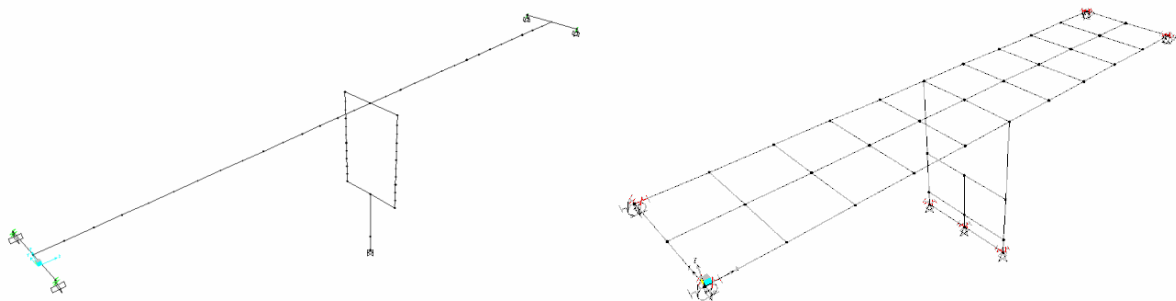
Stick model (a) and grillage model (b) of the bridge.
